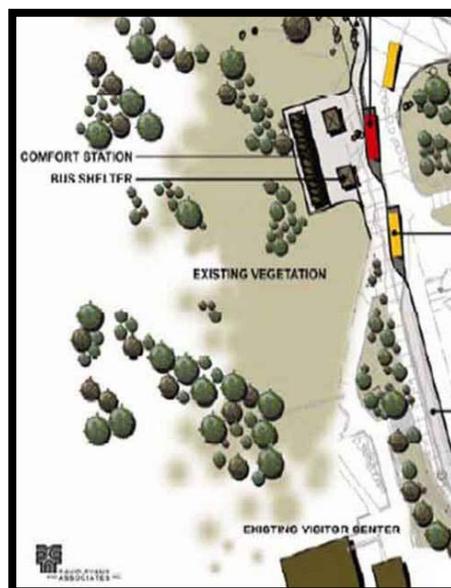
Restroom Constructed North of the Visitor Center (DEA 2008).
